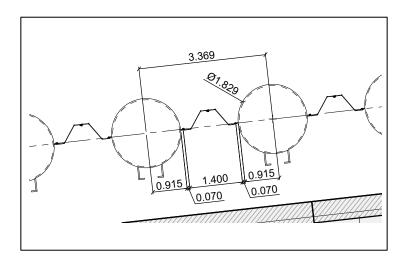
Details of combi wall (Revised dimensions (November 27, 2018))
